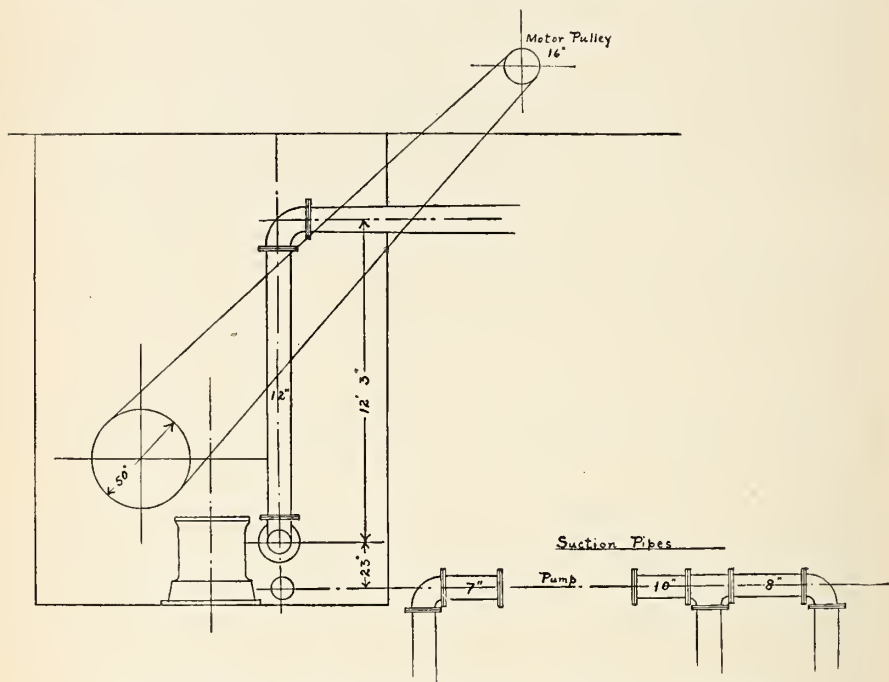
Plan of Peyton pumping plant belonging to Temescal Water Company.
